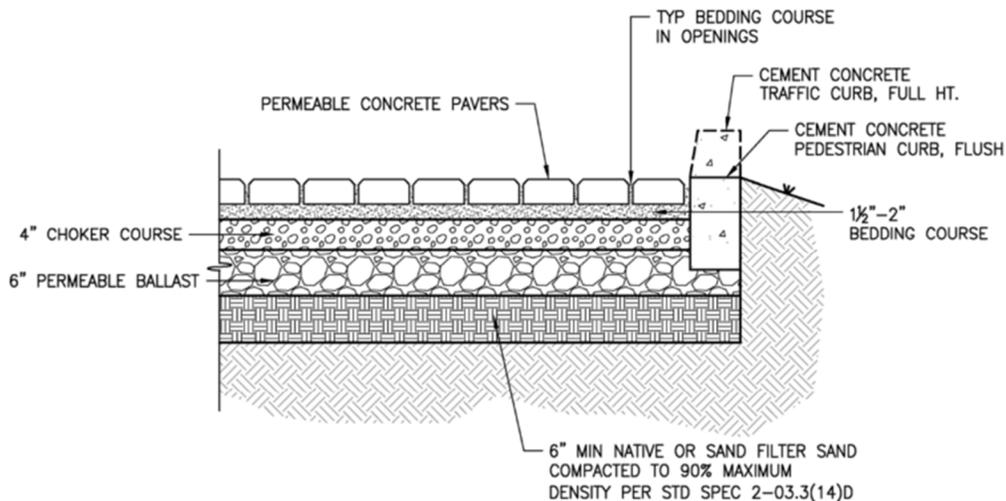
Parking lot cross section from Parametrix drawings (Reference 3).
